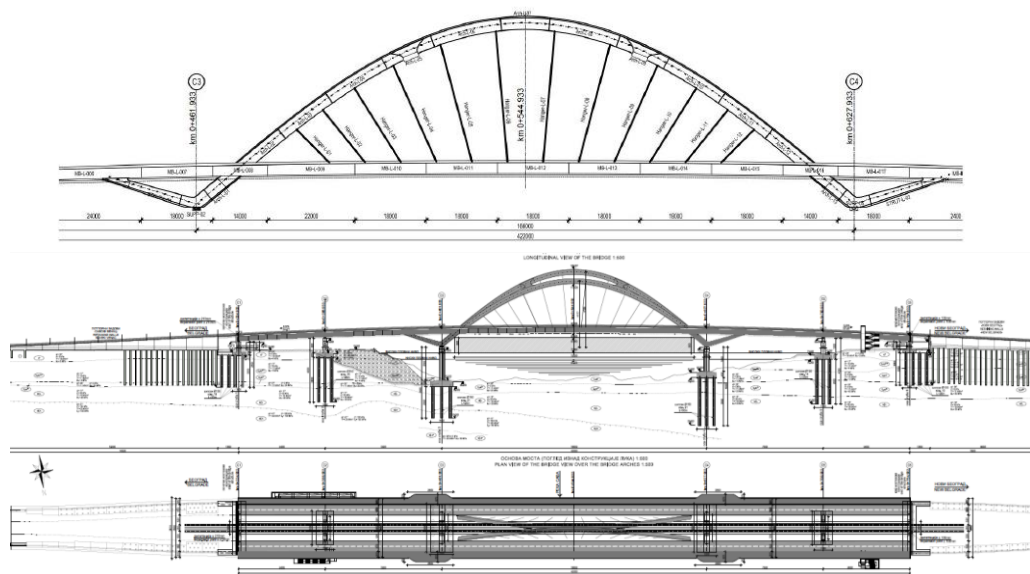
General arrangement of the New Sava Bridge: longitudinal elevation and plan view
